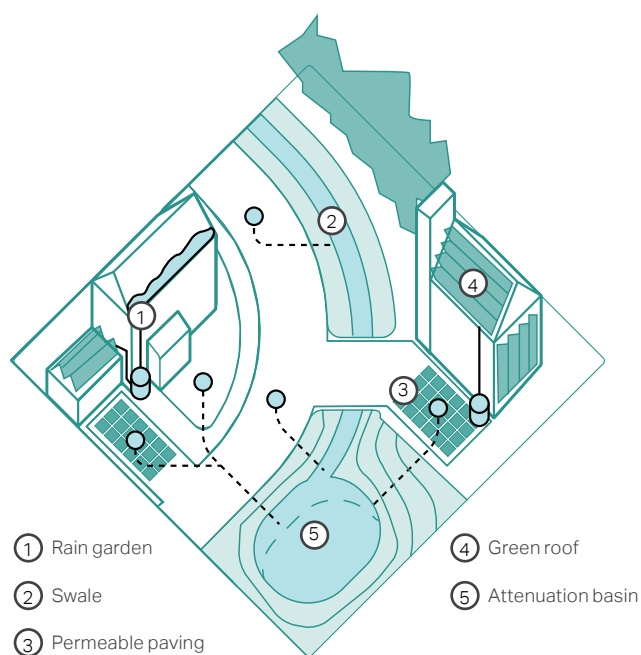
Diagram showing the best use of harvesting water systems rain garden, swales, permeable paving, green roofs
